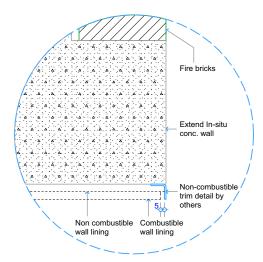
Plan View Fire Surround Opt. 7 Concrete Cavity
